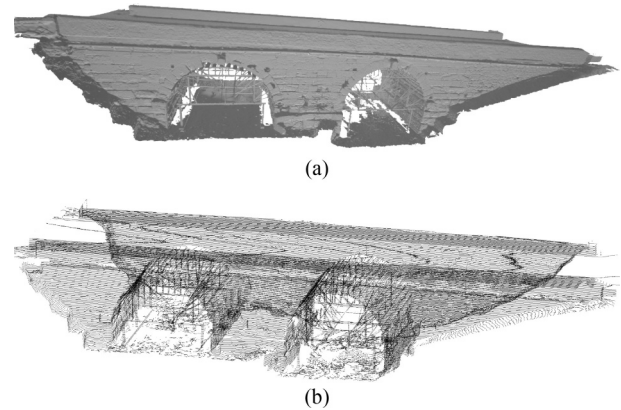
(a) 3D light model; (b) cross sections of the bridge.
